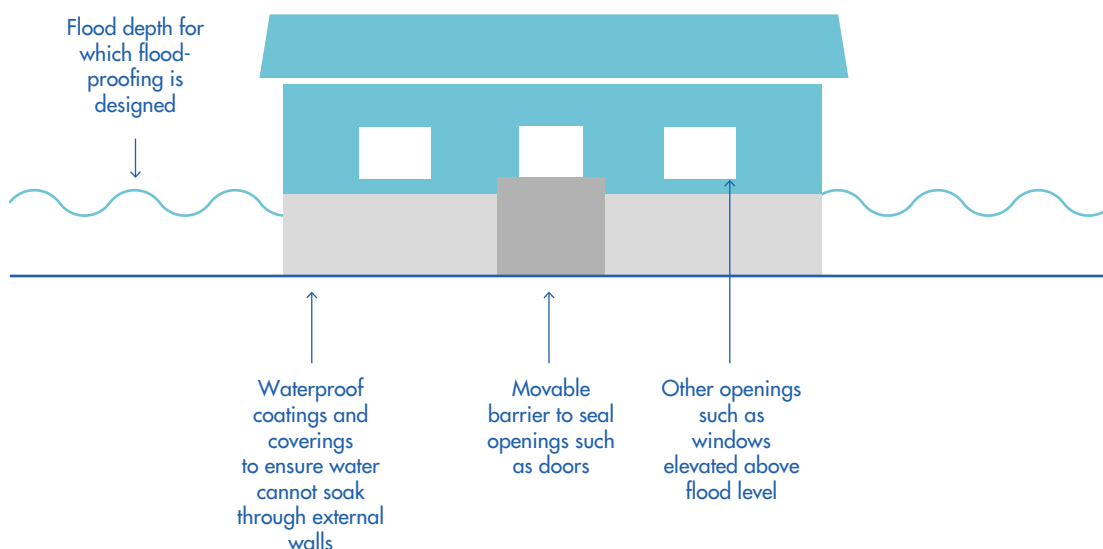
Basic dry flood-proofing measures for a residential structure (Source: Redrawn by the authors).
